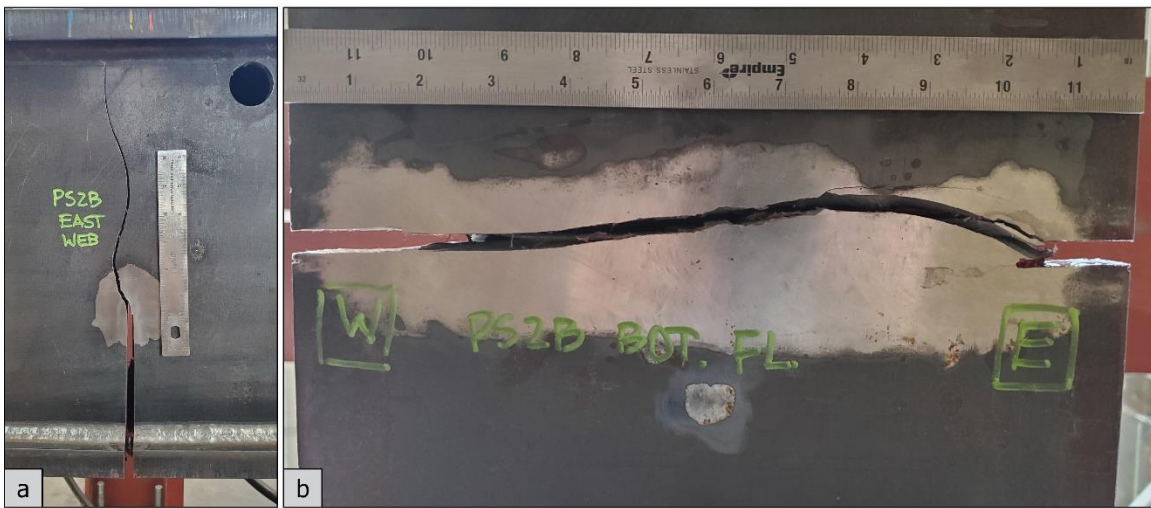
(a) East web and (b) bottom flange cracks produced in PS2B fracture test.
